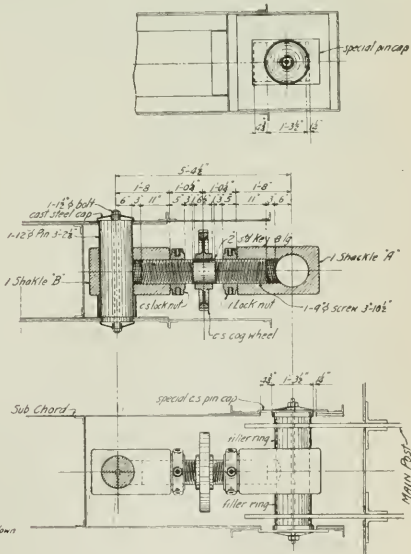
Adjustable Erection Joint Provided in Main Trusses at Panel Point AM14
